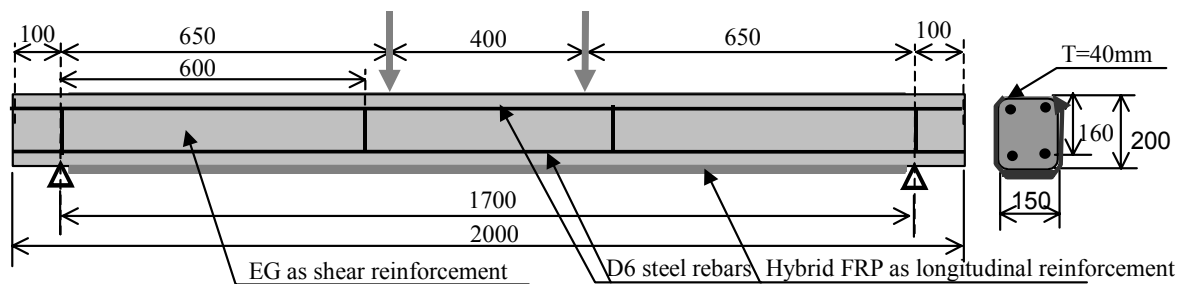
Details of FRP-steel-concrete hybrid beam specimens
